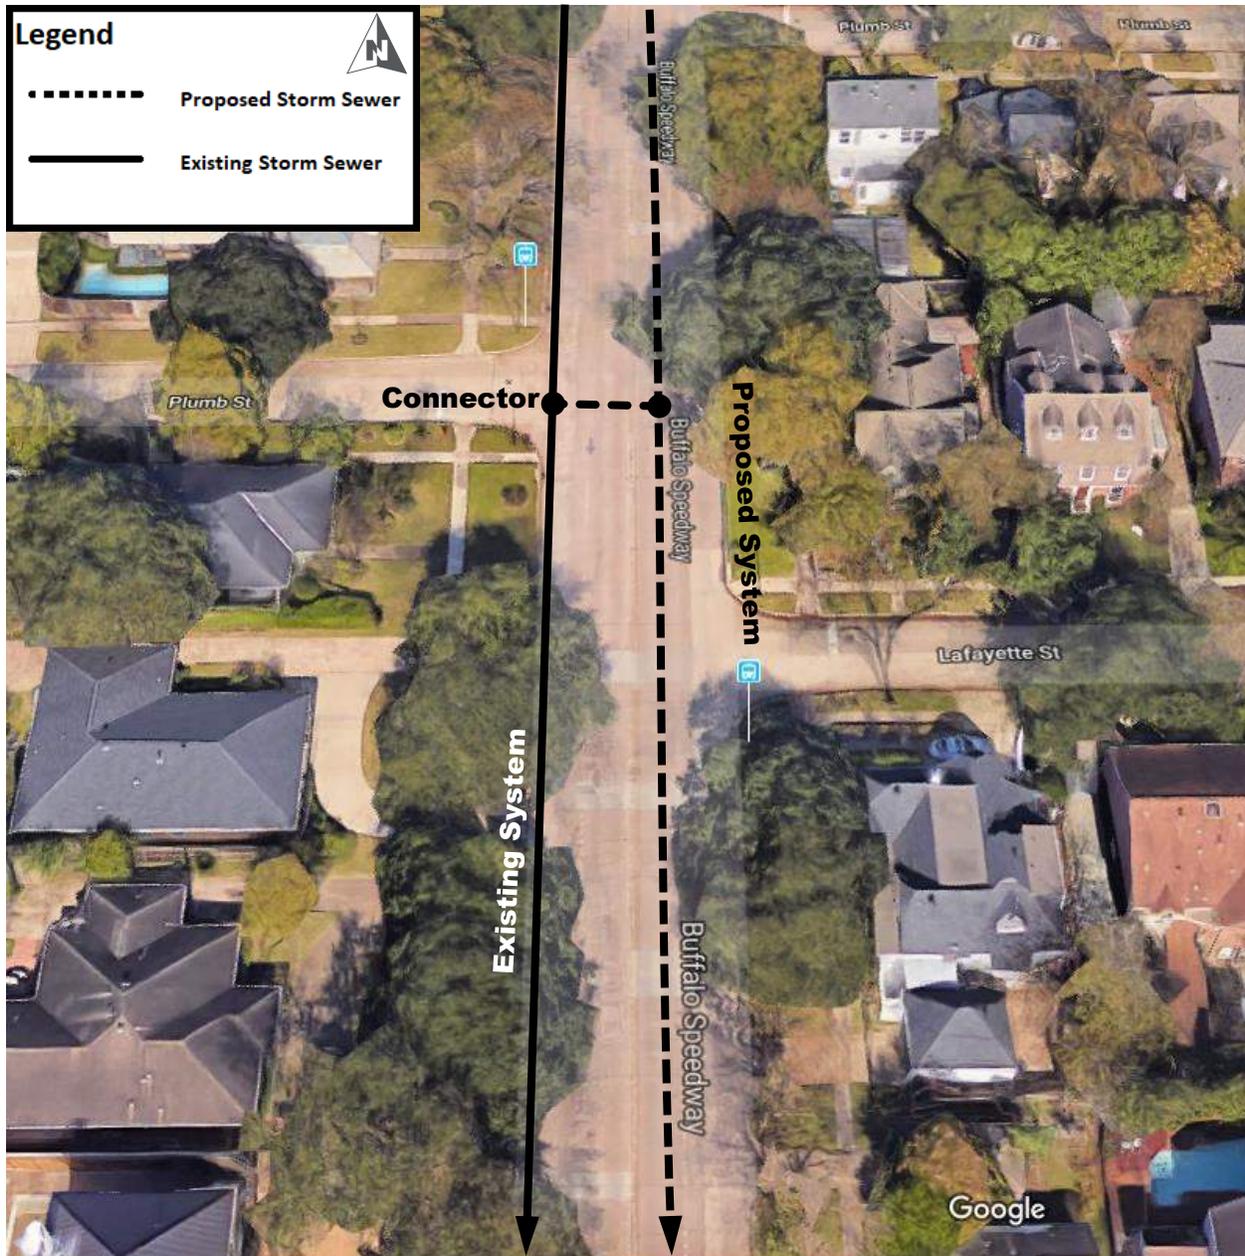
Proposed Storm Sewer Arrangement North of Amherst
